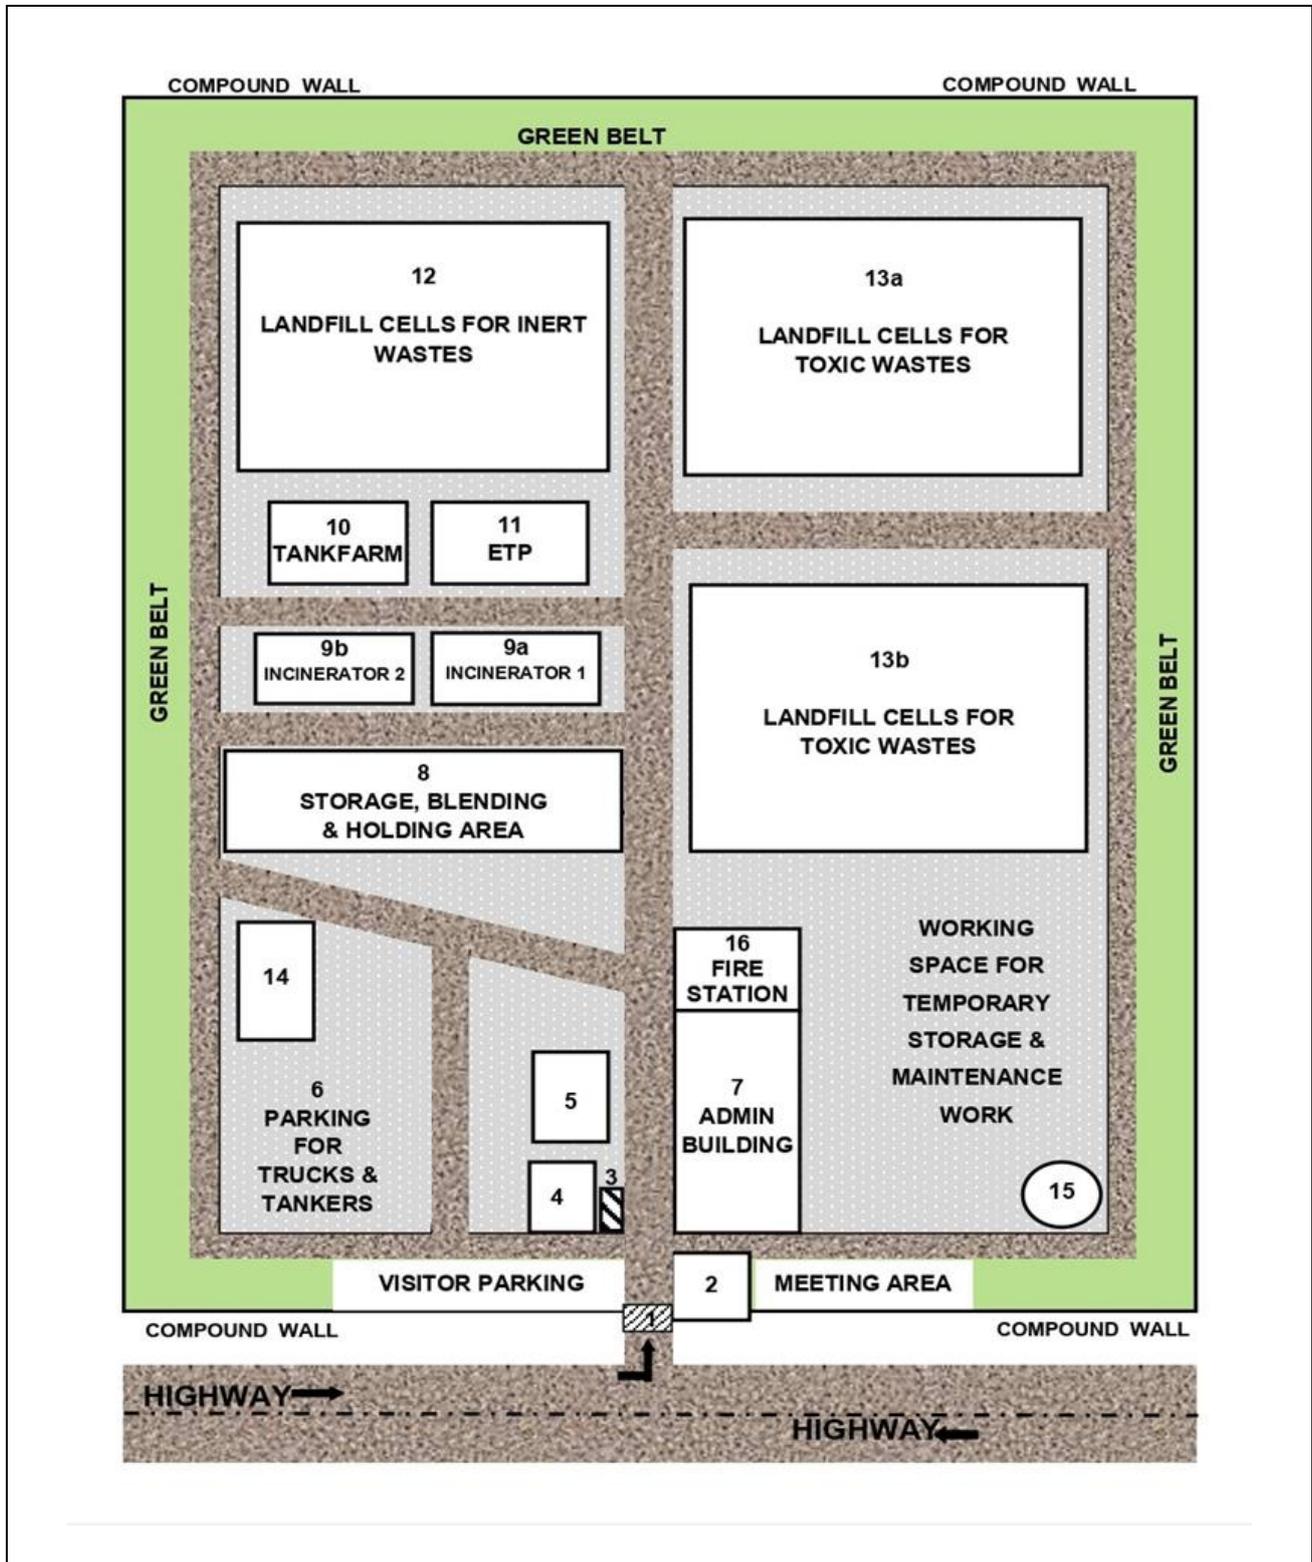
Layout Plan for TSDf of hazardous waste management of ship recycling industries in Zone-24
